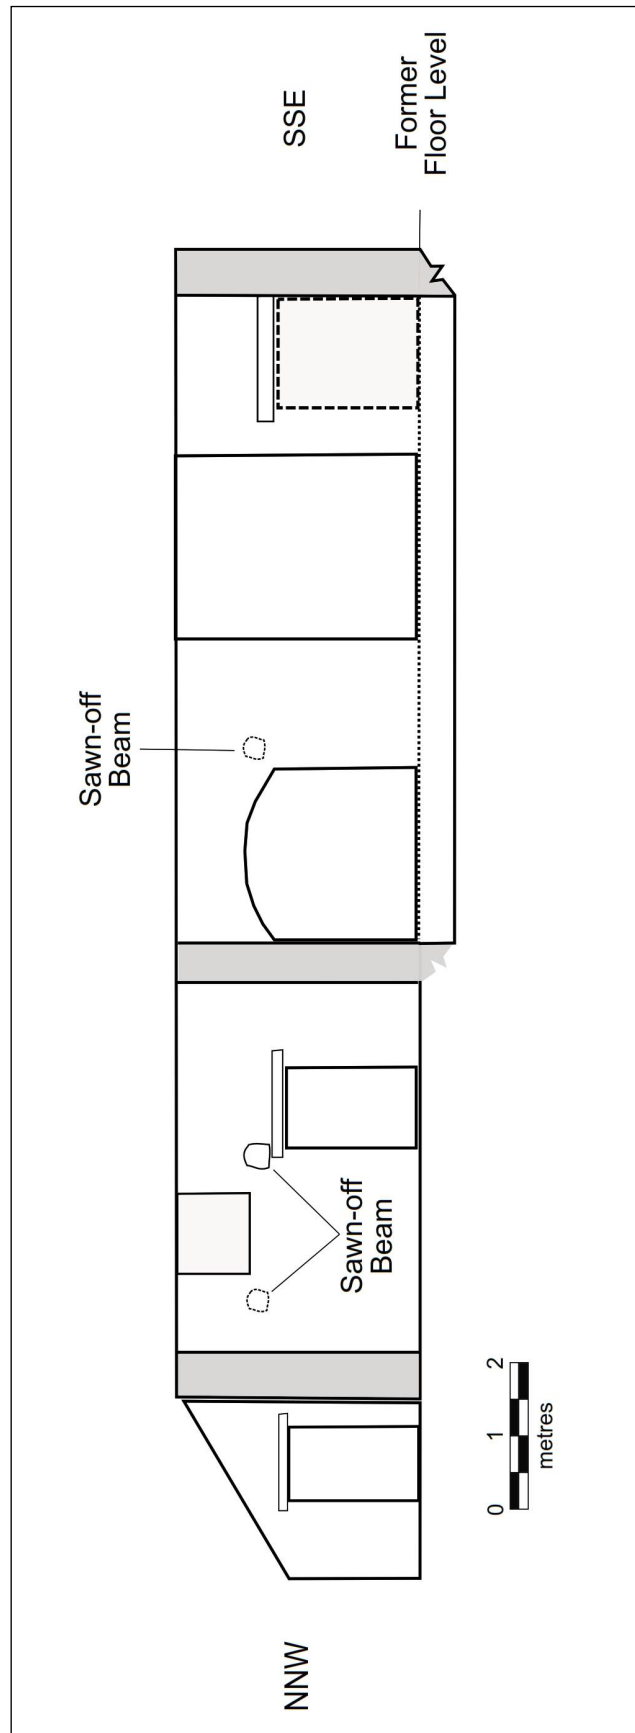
Elevation of inside of east lateral wall of Yew Tree Barn, Defynnog.
